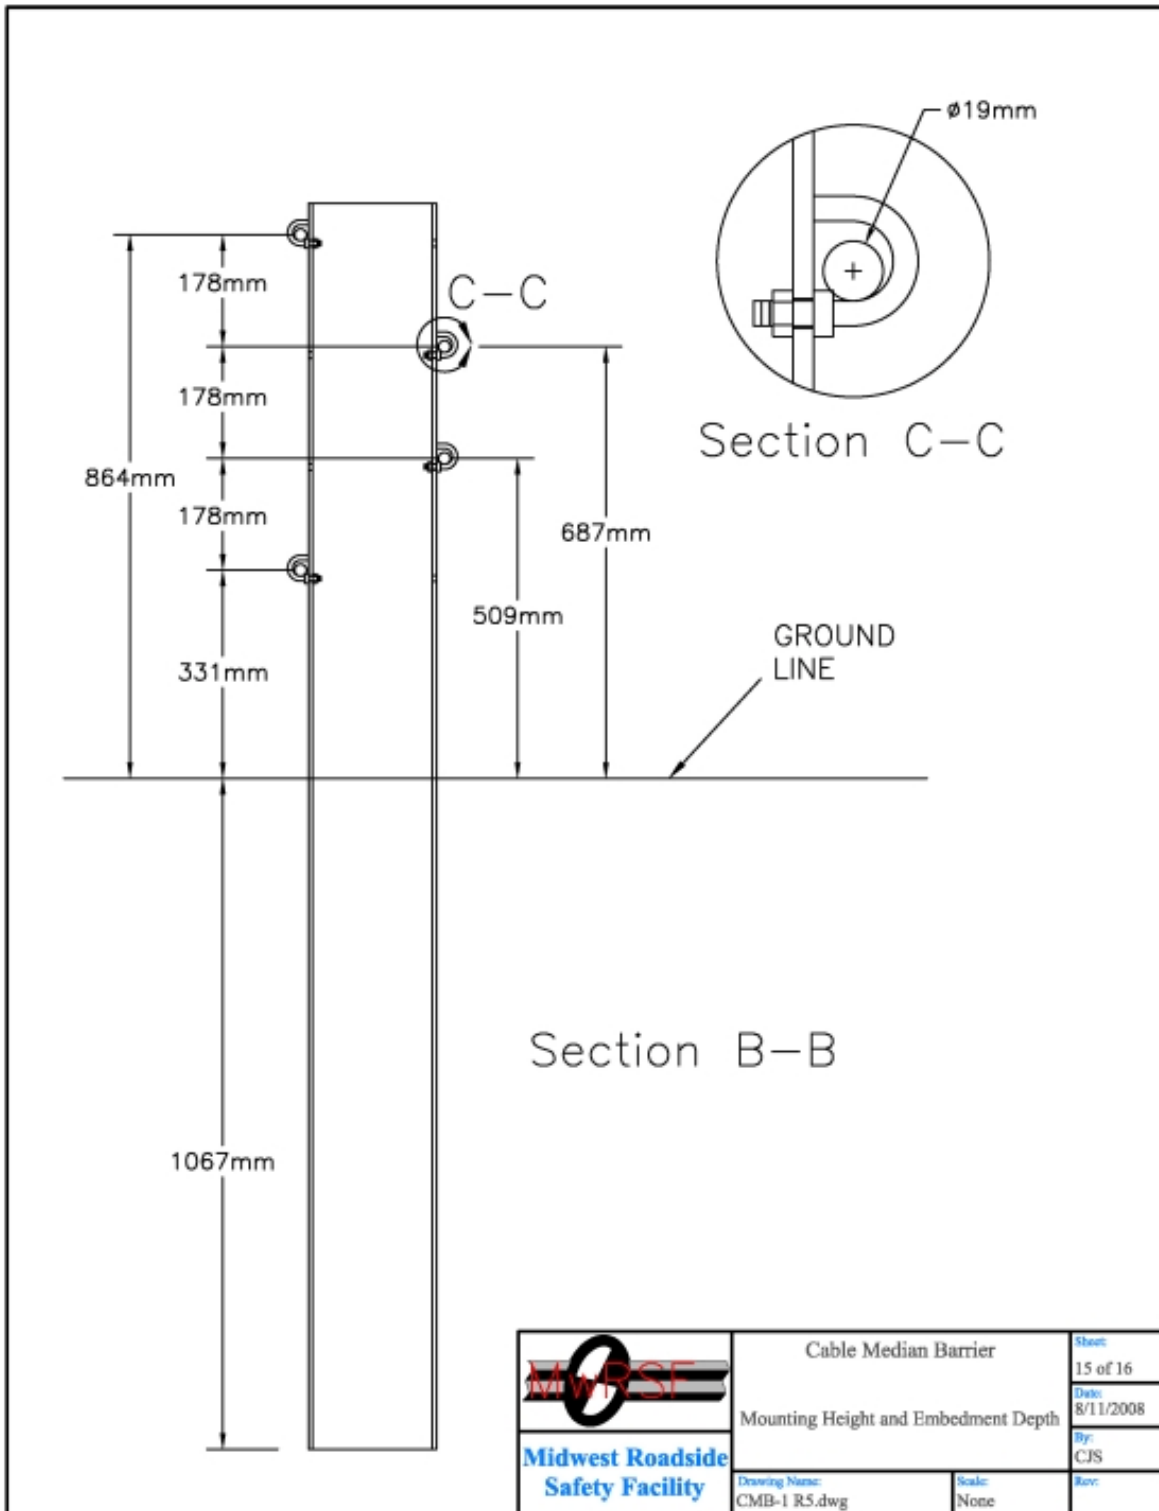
Cable Guardrail Post Assembly, Design No. 1
